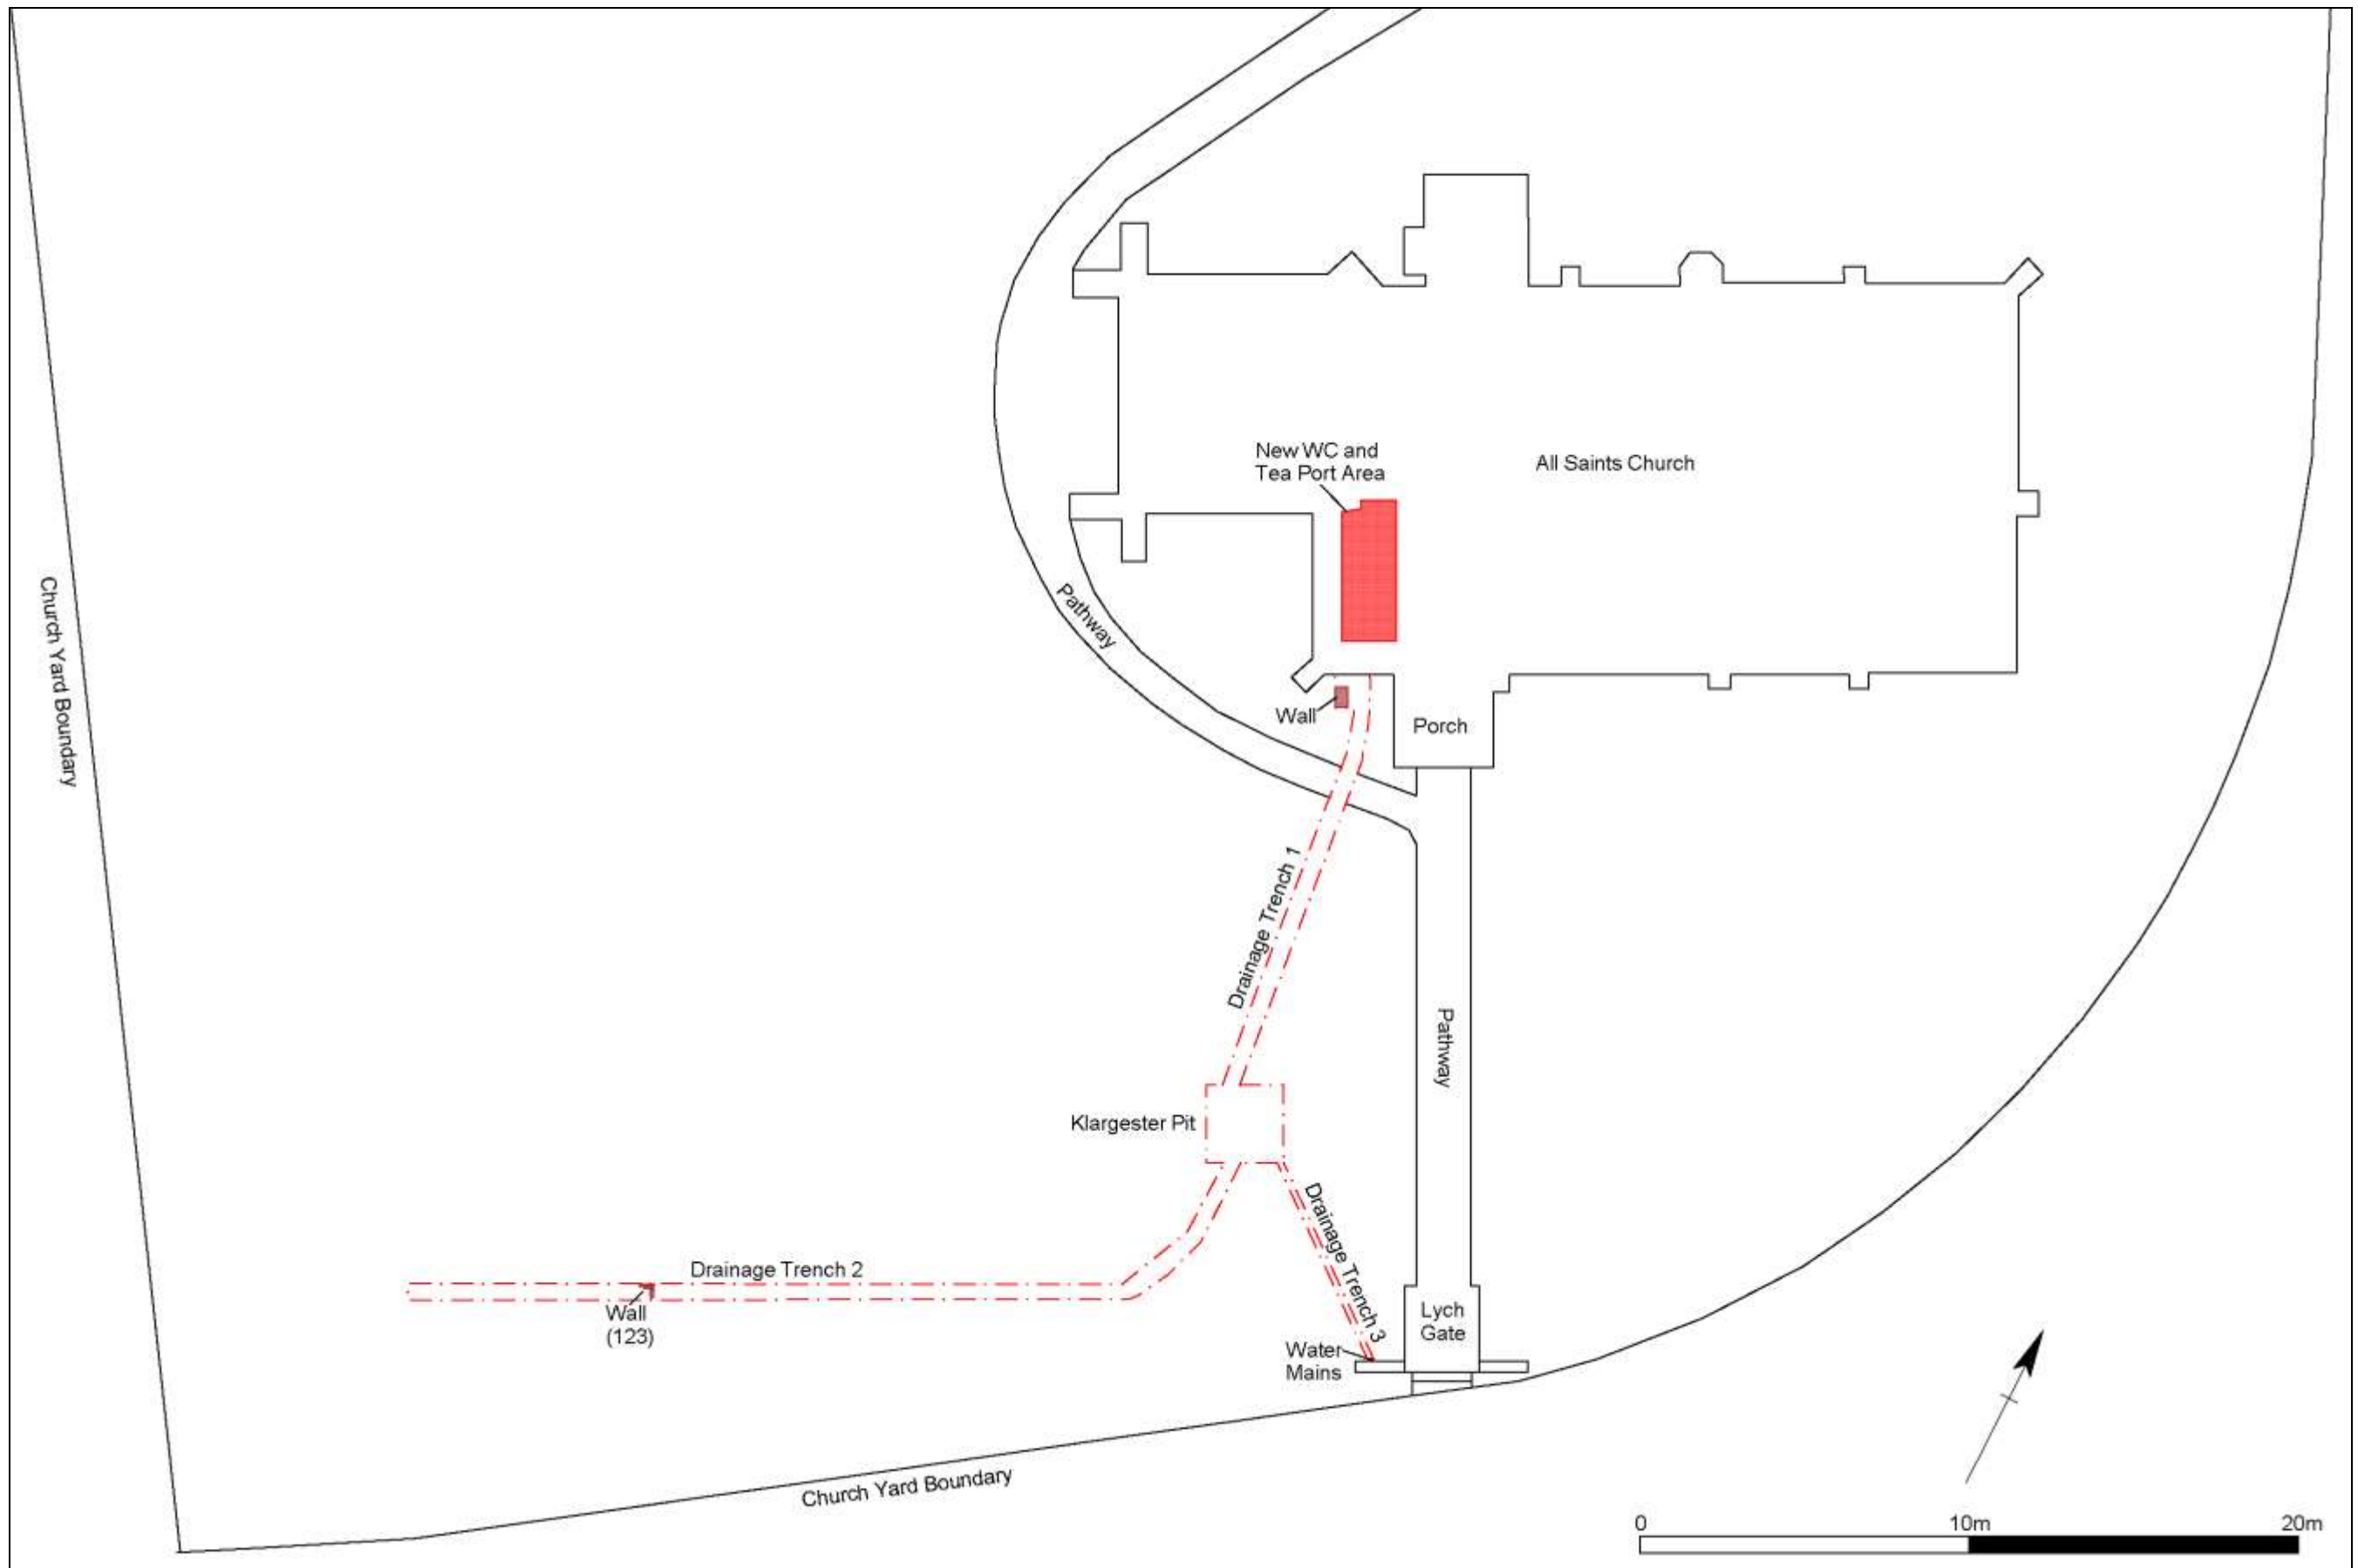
Site Plan depicted excavation areas (scale 1:200)
